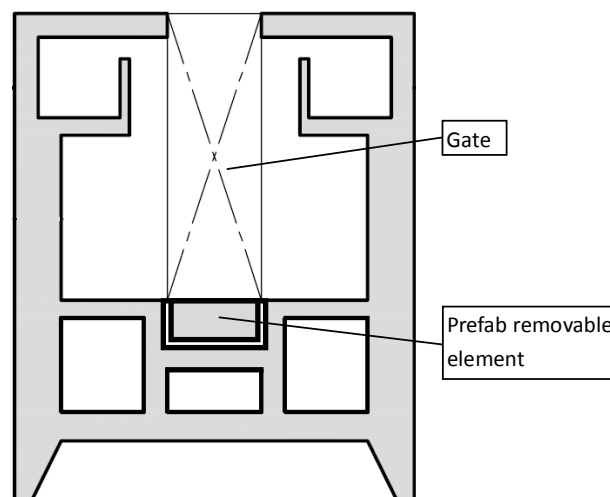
Cross section gate recess, based on (van Sloten, et al., 2011)
